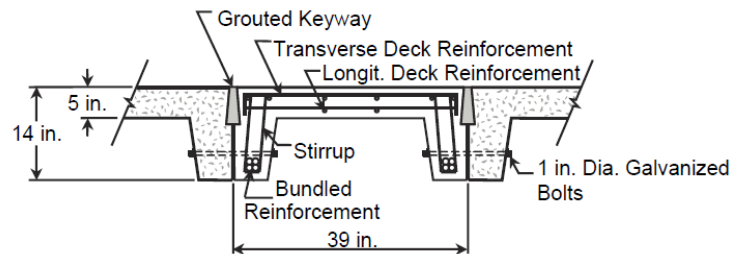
Typical Channel Girder Cross Section (Wipf 2006)
